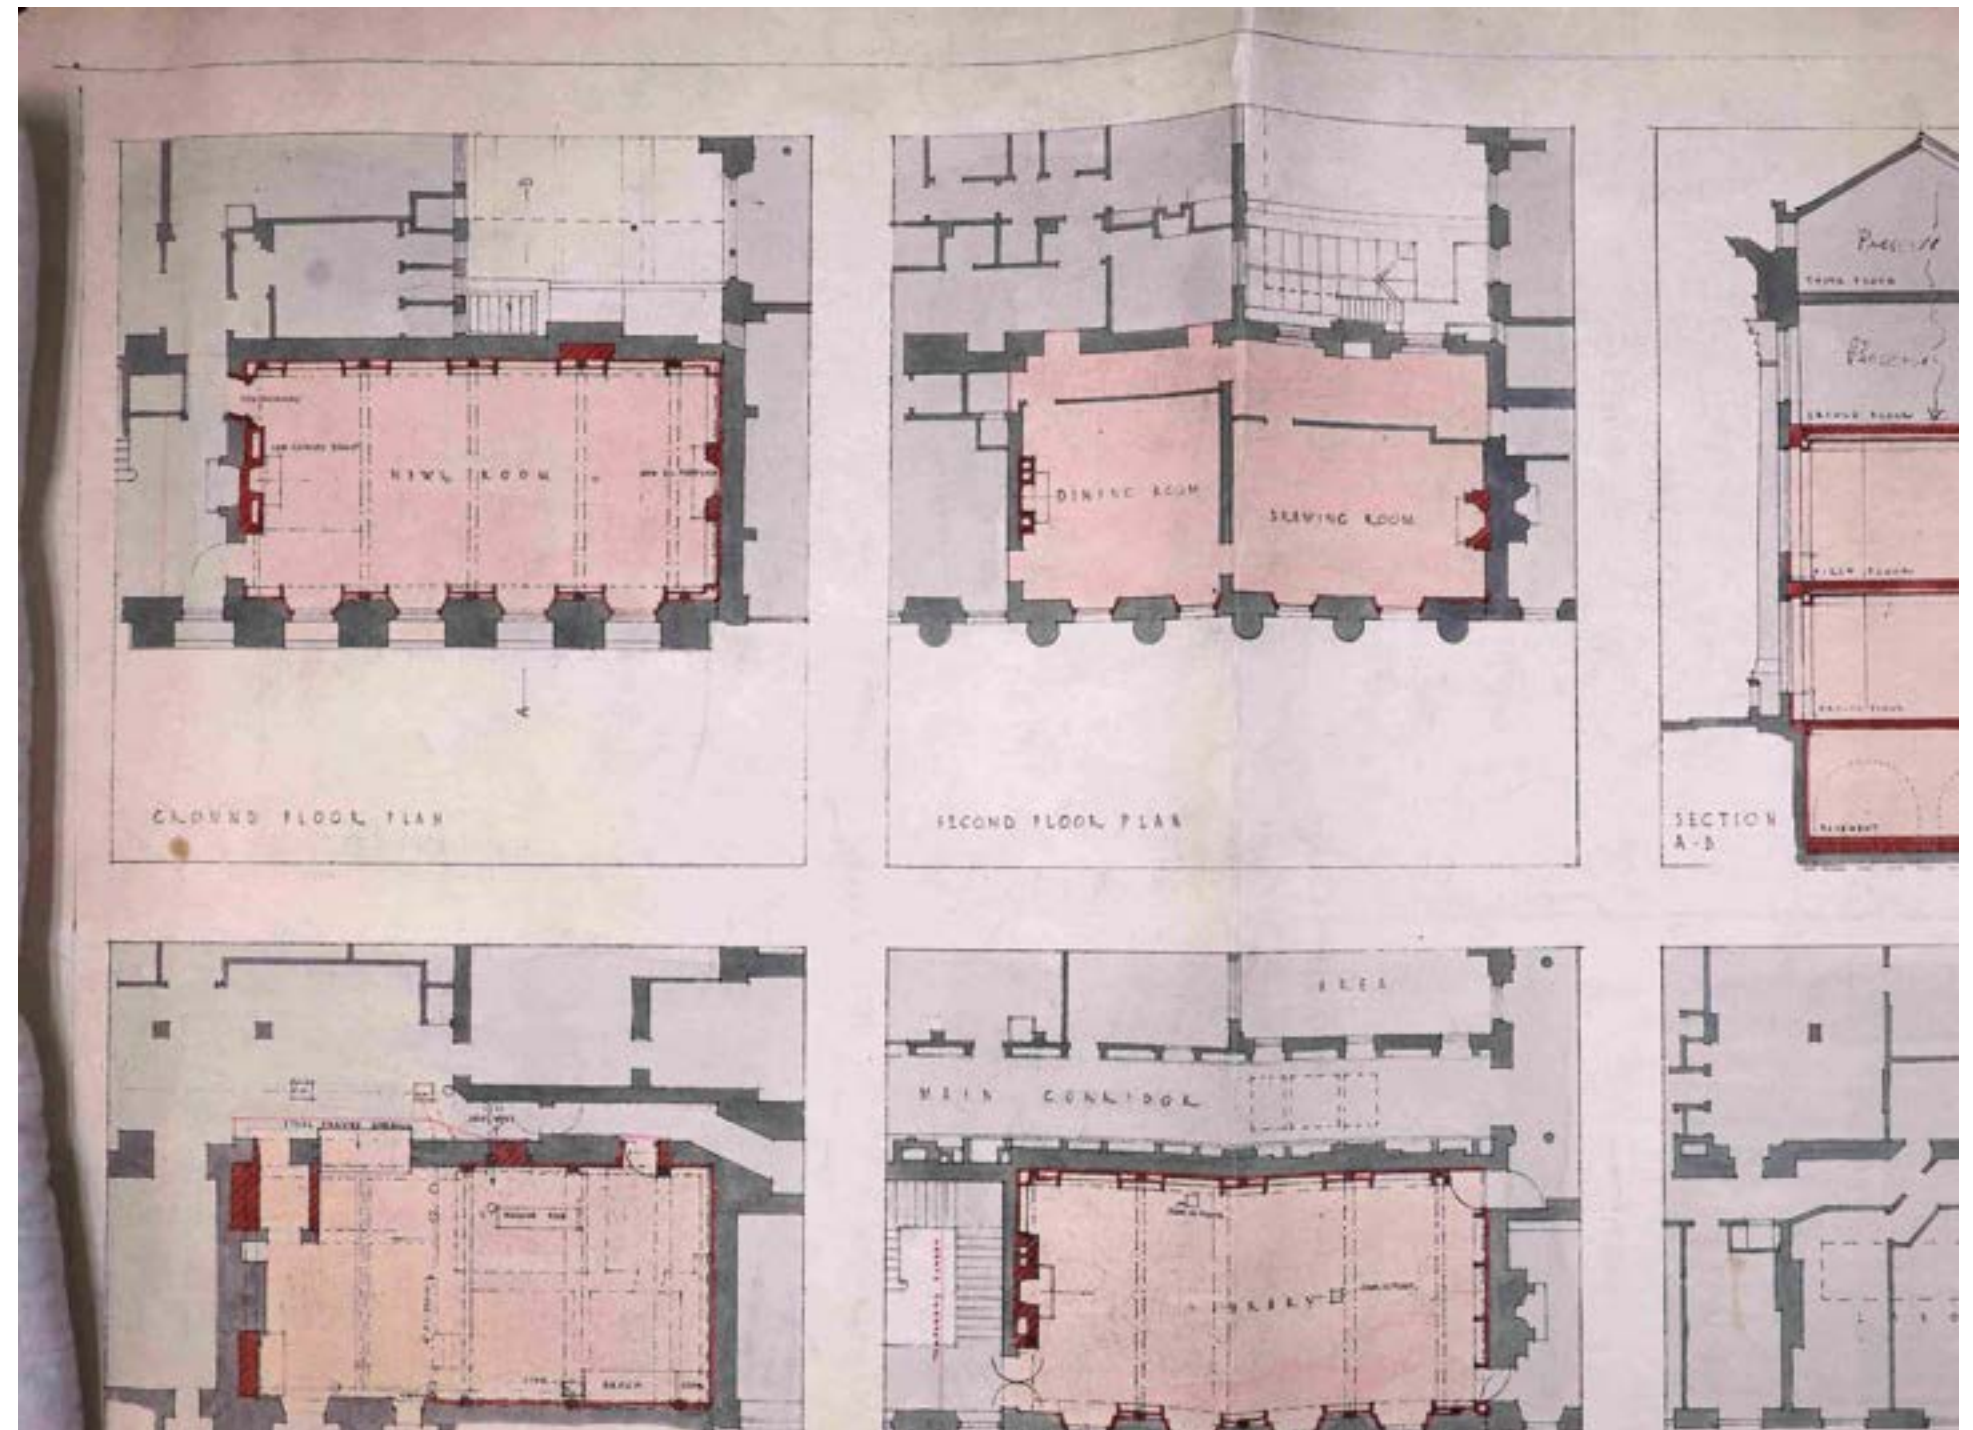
A Guthrie drawing with a section and floor plans, which combine to give a handsome full account of the mid-1930s scheme of works. Ri Archival Collection
